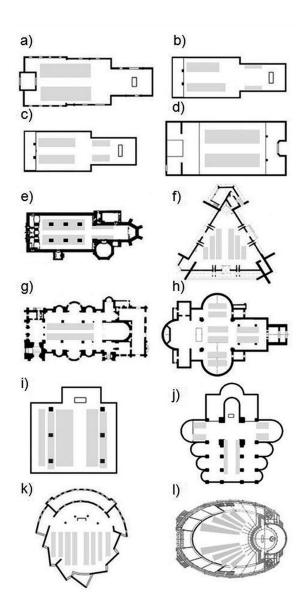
Ground plan with pew zone (shaded area) for the 12 churches surveyed: a) St. Sebastian's Church, Strzelce Wielkie (SE); b) St. Andrew's Apostle Church, Gilowice (AA); c) St. Joachim's Church, Krzyżanowice (JO); d) The Holiest Sacred Heart's Church, Cracow (NS); e) St. Clemens Church, Wieliczka (KL); f) The Holy Cross Increase Church, Psary (PK); g) The Jesuits Fathers Church, Cracow (JE); h) St. Peter and Paul Apostles' Church, Trzebinia (AP); i) St. John the Baptist Church, Cracow (JC); j) St. Joseph's Church, Cracow (JF); k) St. Paul Apostle Church, Bochnia (PA); l) Sanctuary of the Divine Mercy, Cracow (BM).
